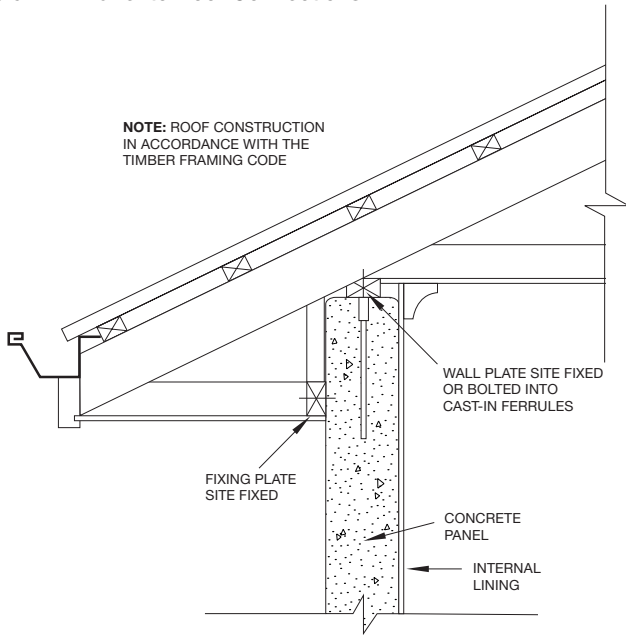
Panel to Roof Eave Connection – Extended Eave. (Roof framing is supported by top of wall panel via bolting into cast-in ferrules)
